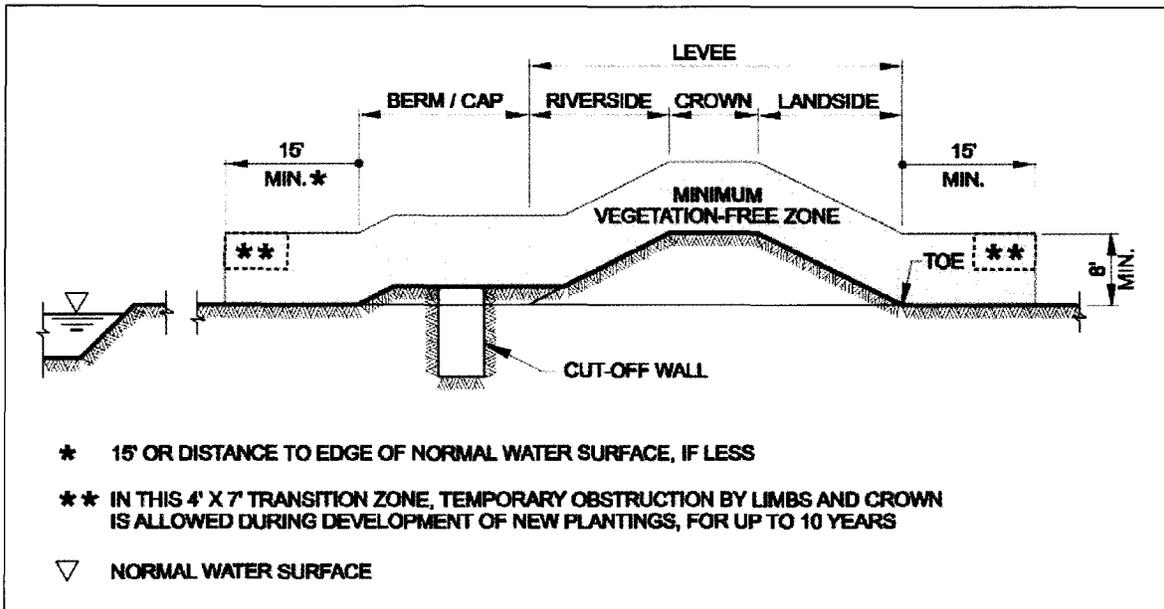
Levee Section with Cut-Off Wall and Impervious Berm.
